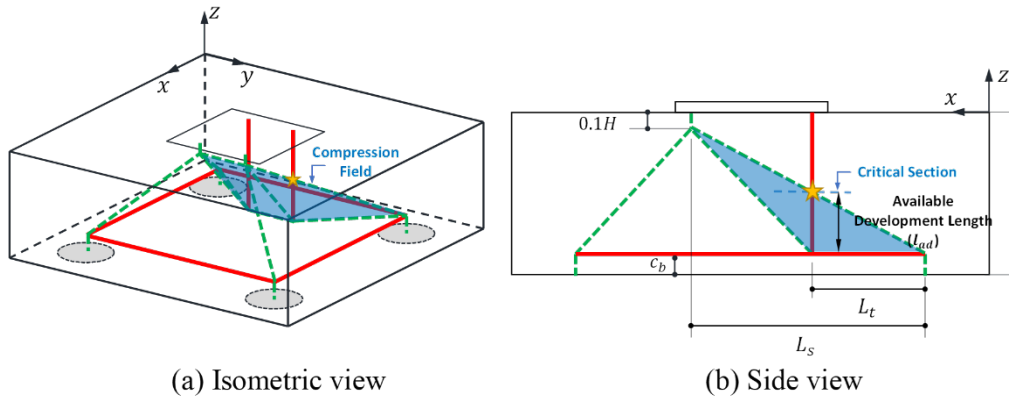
Critical section for column reinforcement in drilled shaft footings under Load Case III
